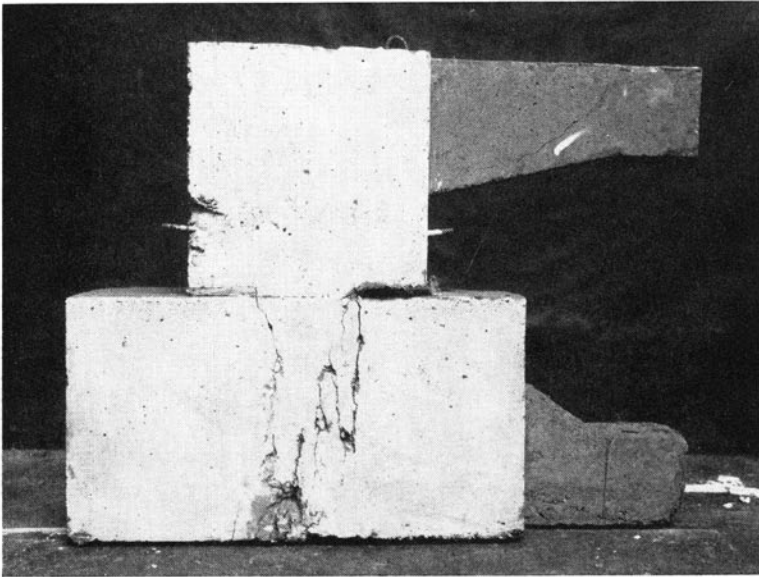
(b) VIEW OF HINGE AFTER LOAD-ROTATION TEST TO FAILURE
